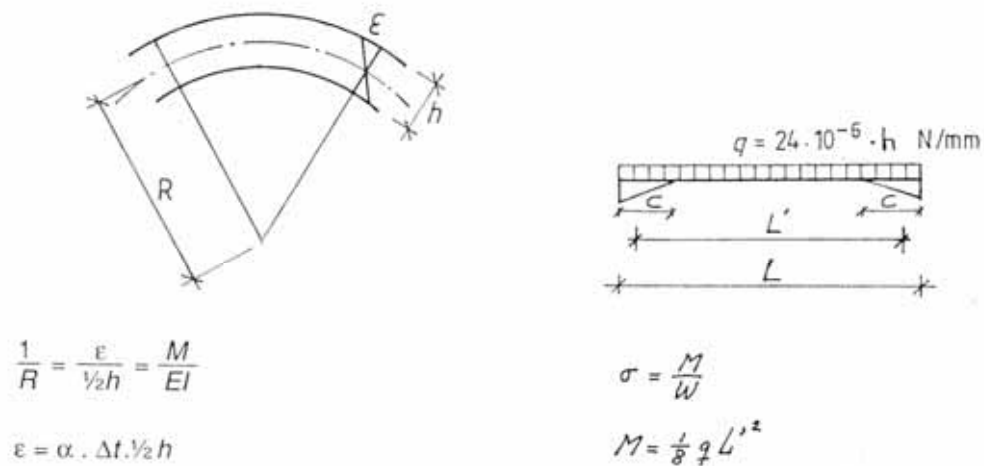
Basic equations of the Dutch method for the calculation of the flexural tensile stress at the bottom of the concrete slab in the centre of the edge (plain concrete pavement) or the crack (reinforced concrete pavement) due to a positive temperature gradient Δt that is smaller (left) or greater (right) than the limit temperature gradient Δt_l .
